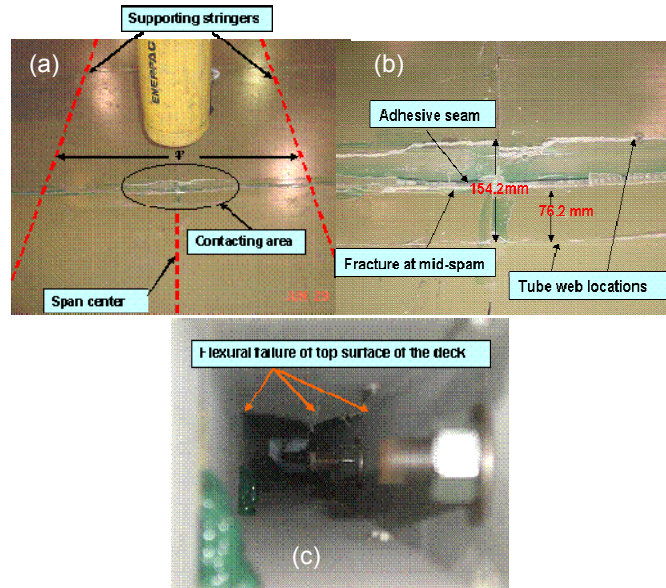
Failure mode (a) localized failure (b) Failure detail on top surface (c) failure inside tube
